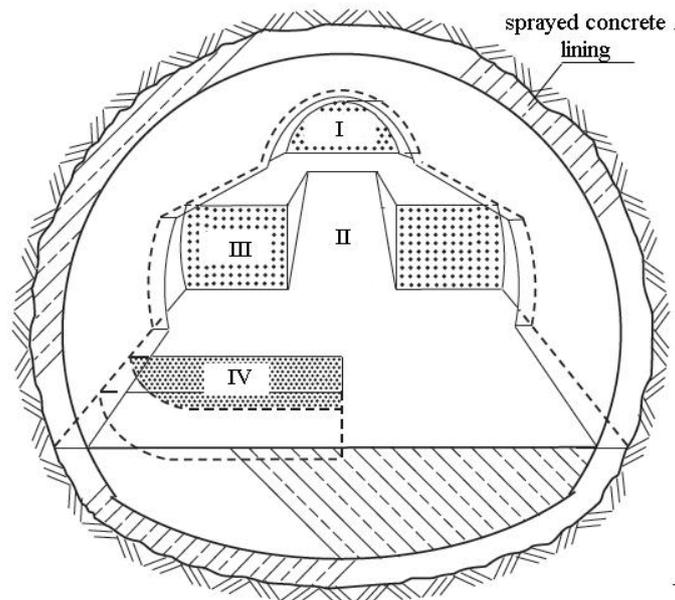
Sequence of the excavation in tunnel construction by applying NATM technologies: I – crown excavation; II – center bench excavation; III – lateral bench excavation; IV – invert excavation
